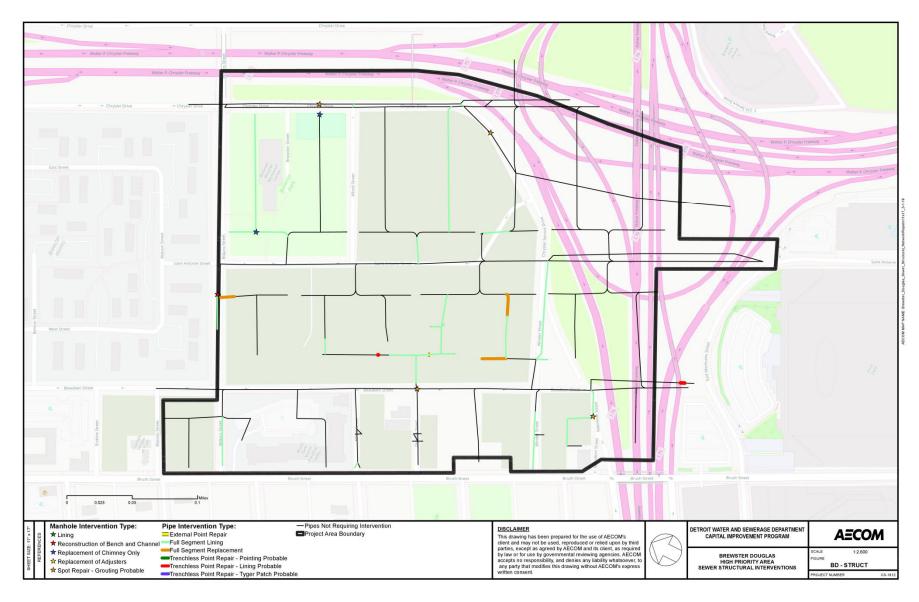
Brewster – Douglas Sewer Structural Repairs
